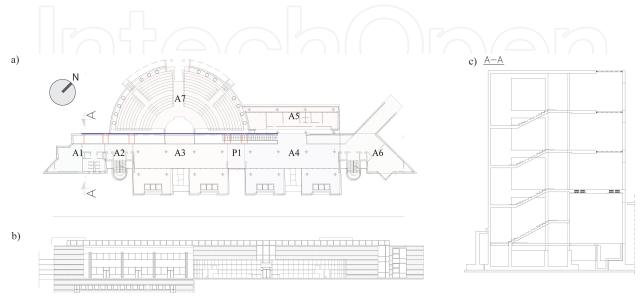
Edifice A: a) plan view at the main entrance level 0, b) facade view c) section A-A
